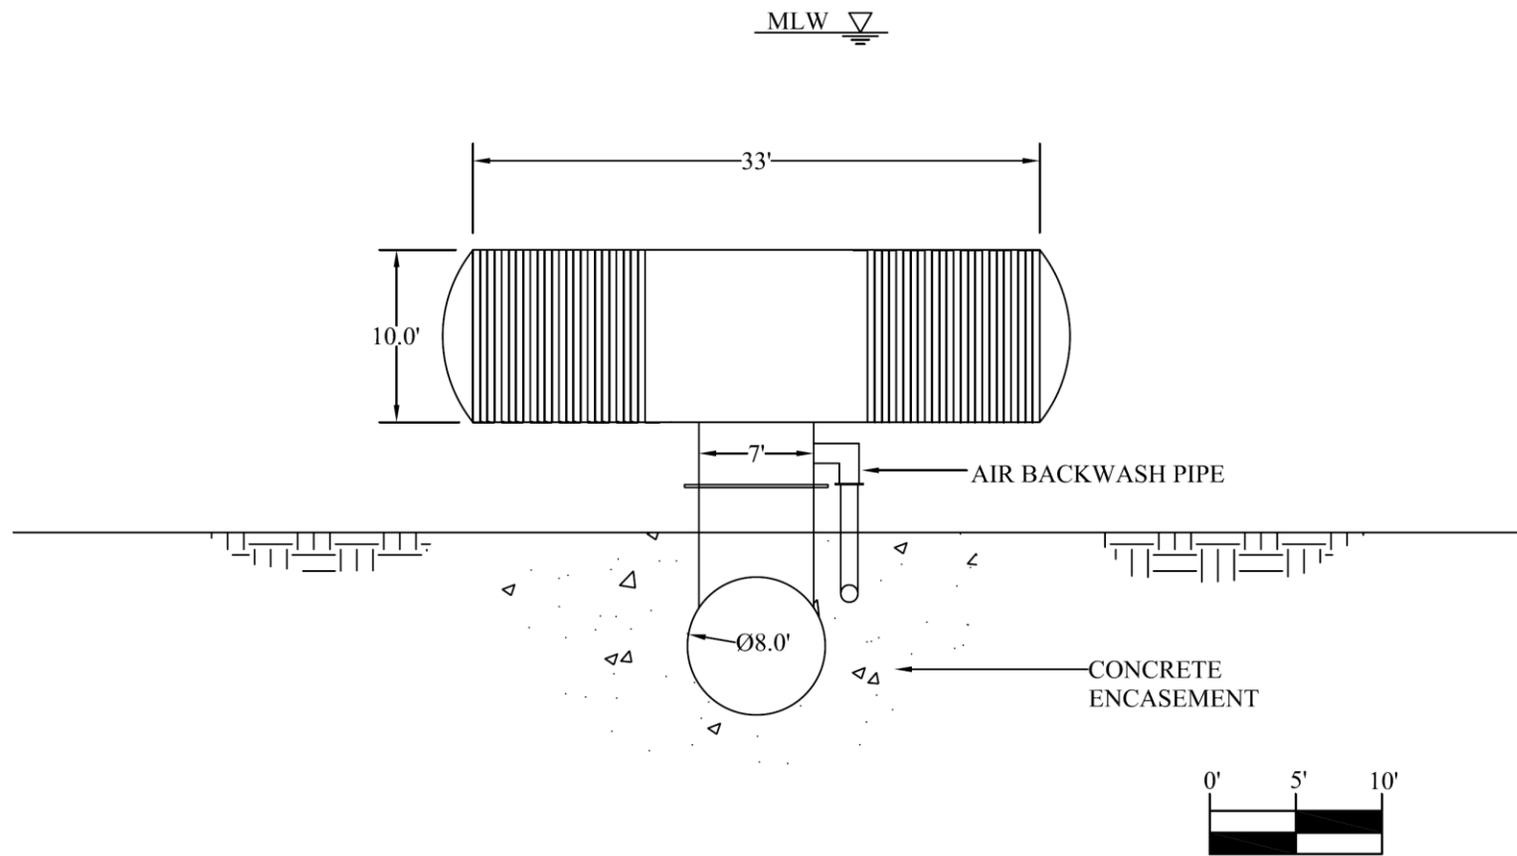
Wedgewire Layout 3 “Pipe-mount”- Section
